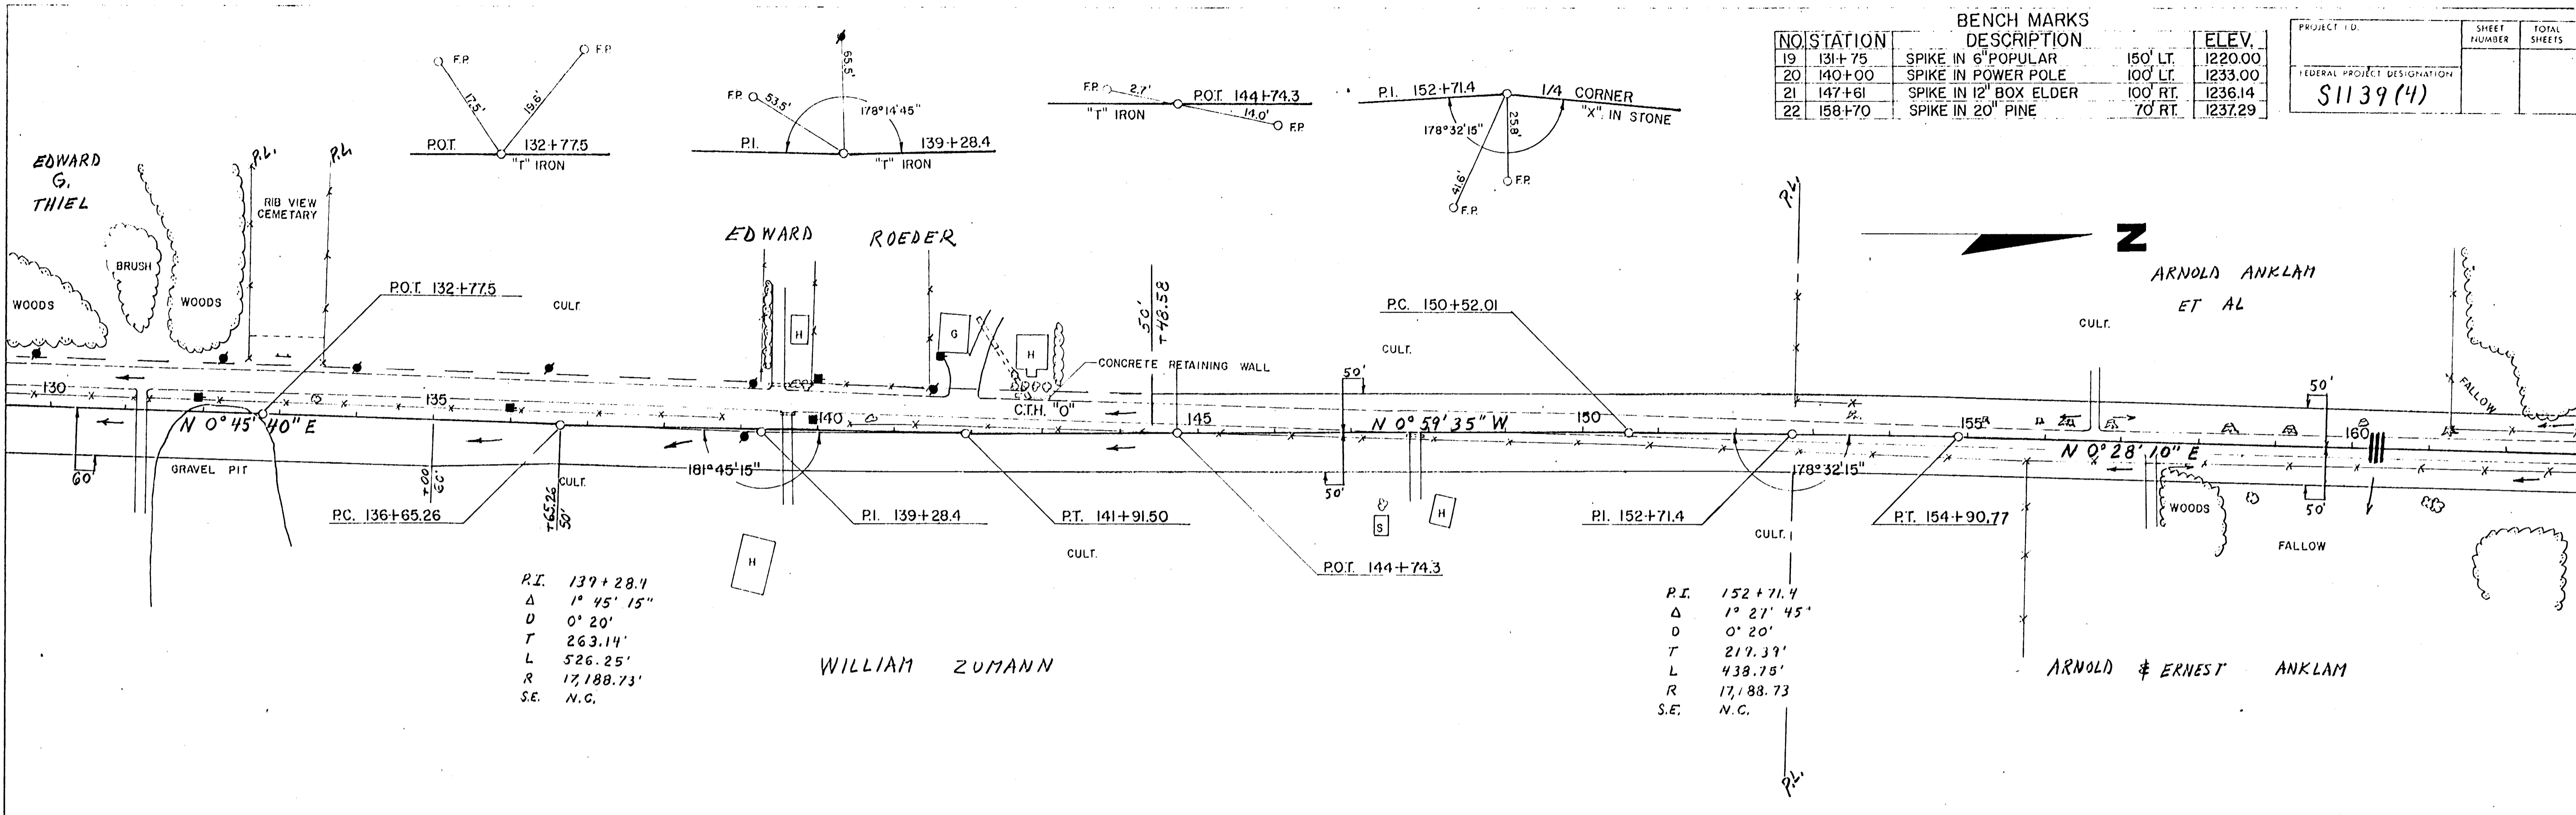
PLAN PROFILE OF ROAD STANDARDS
